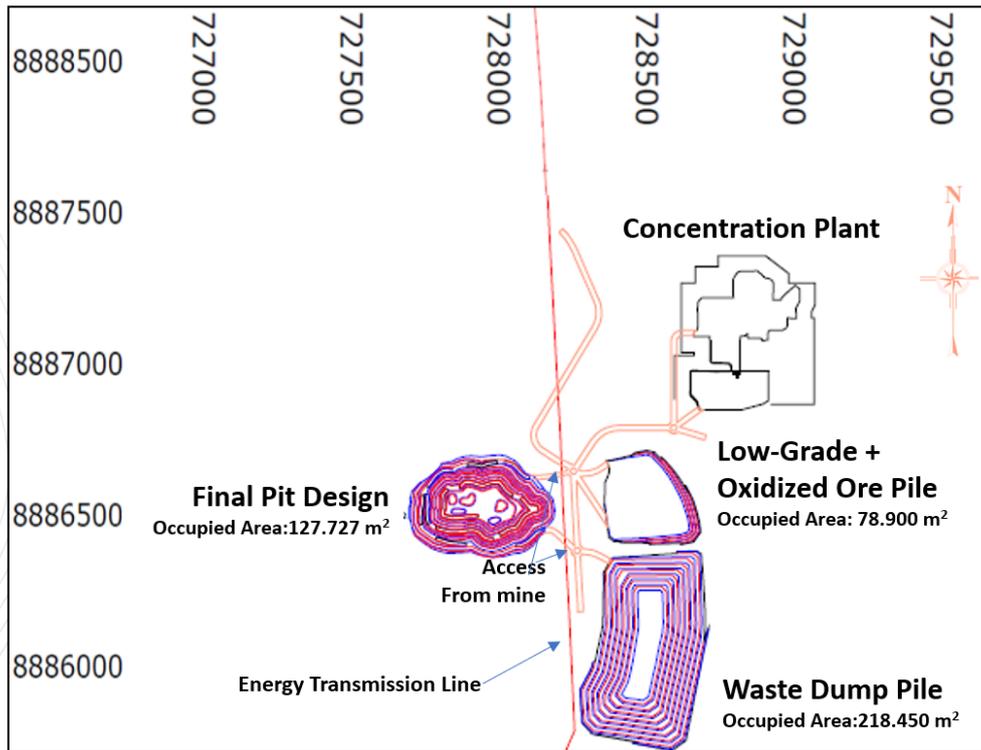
General Layout Including Final Waste Dump Pile, Oxidized Ore and Low-Grade Ore Pile and Final Pit Design.
